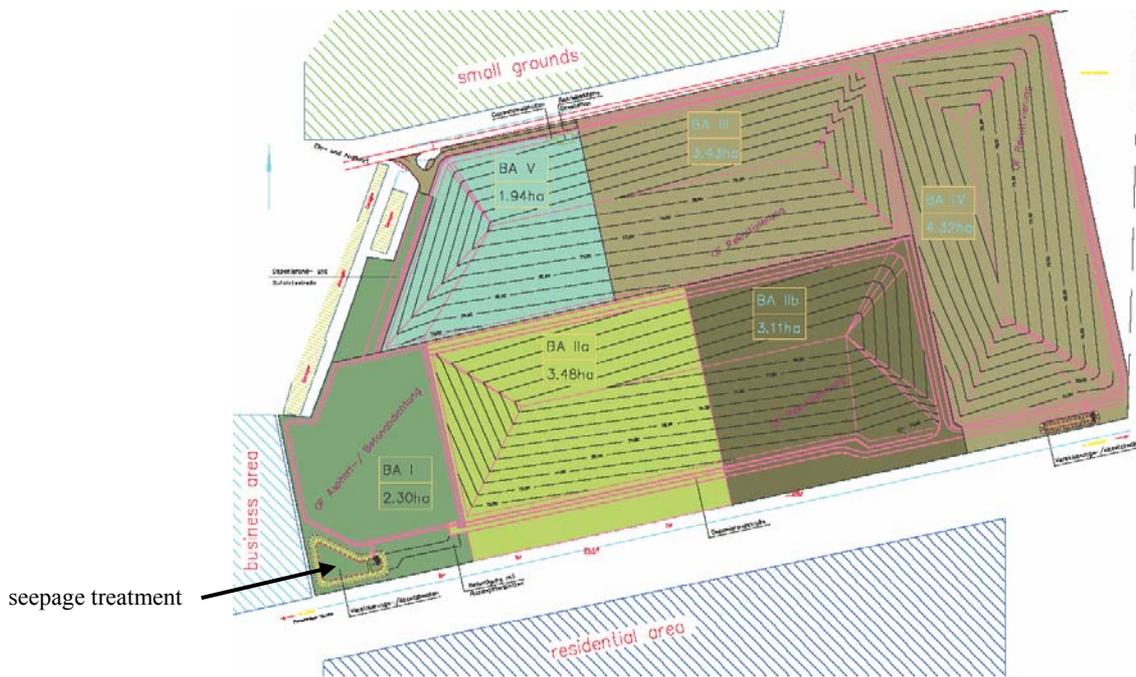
Position plan of landfill Zerbst, building sections and location in the city
